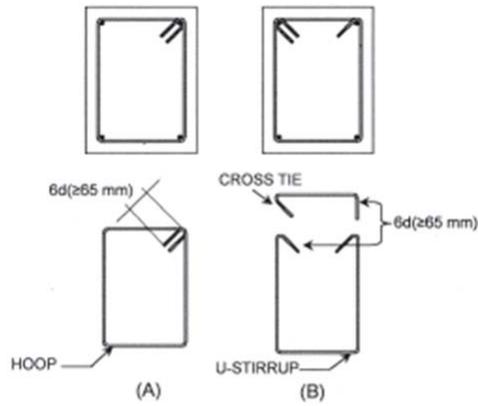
DETAILS OF TRANSVERSE REINFORCEMENT IN BEAMS
